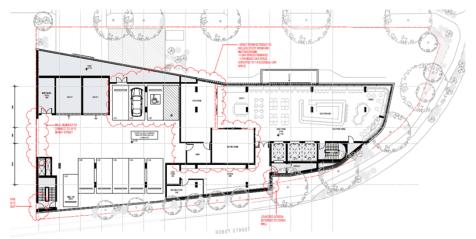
Proposed Level 1 floor plan demonstrating larger 'Great Room'
